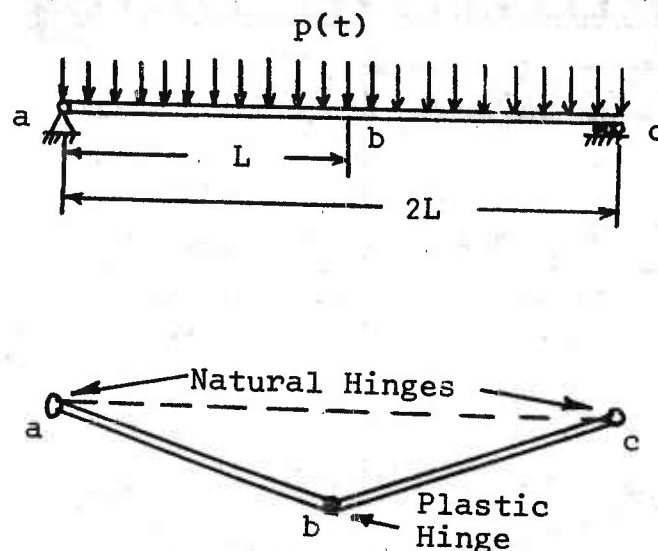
Static Beam Failure Due to Plastic Hinge
